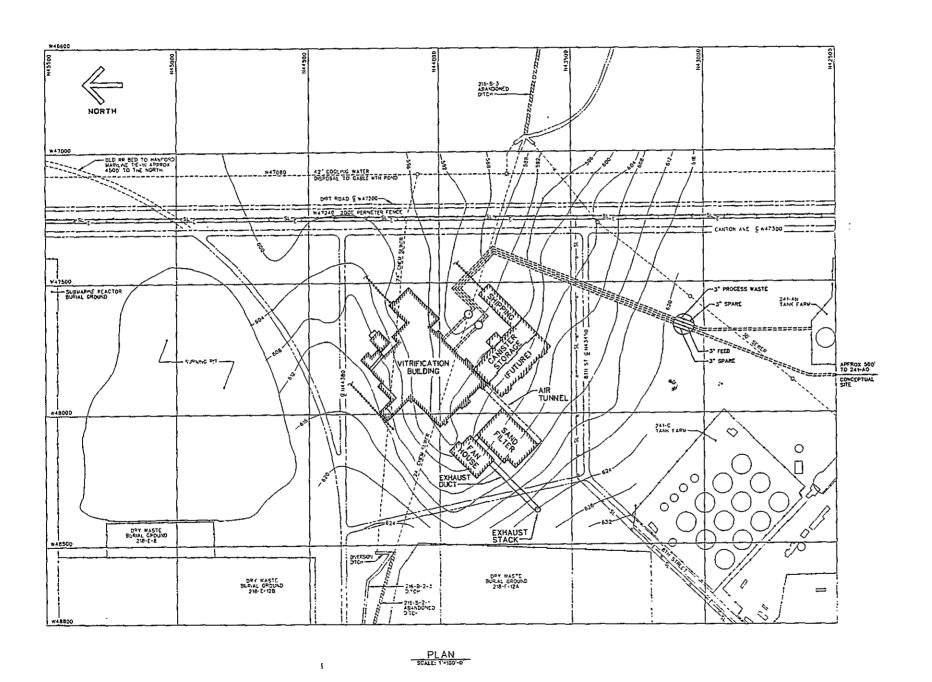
Civil Hanford Waste Vitrification Plant Site 6.
